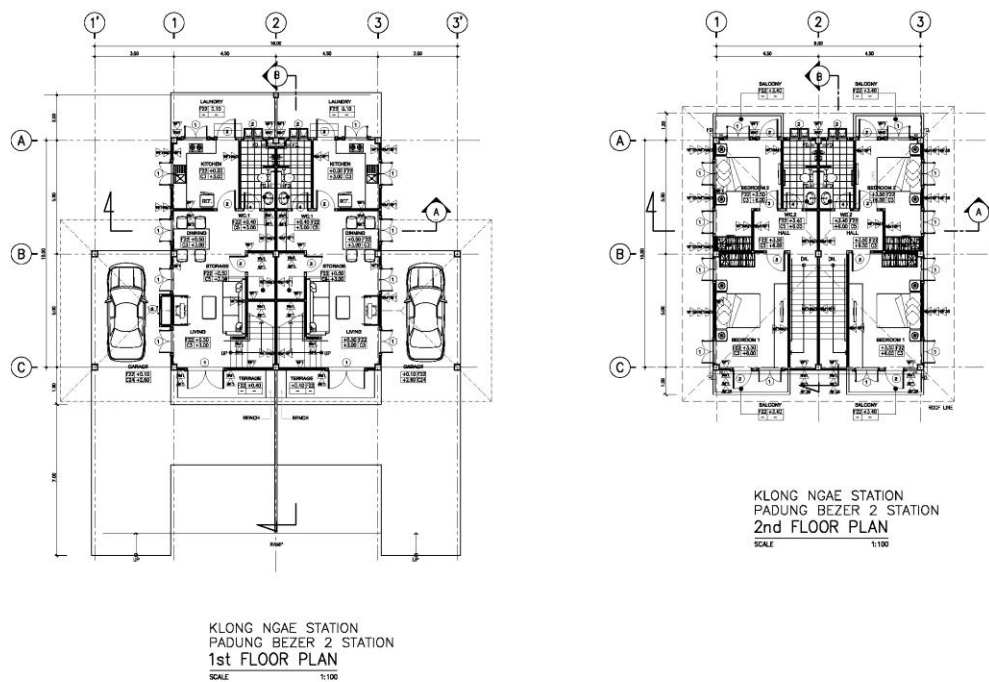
The Staff Lodge Type A Plan, Padang Bezar 2 Station
